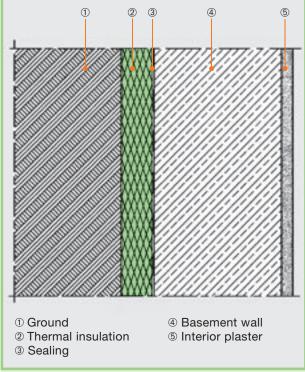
Basement wall with outside insulation layer, bordering the ground.
